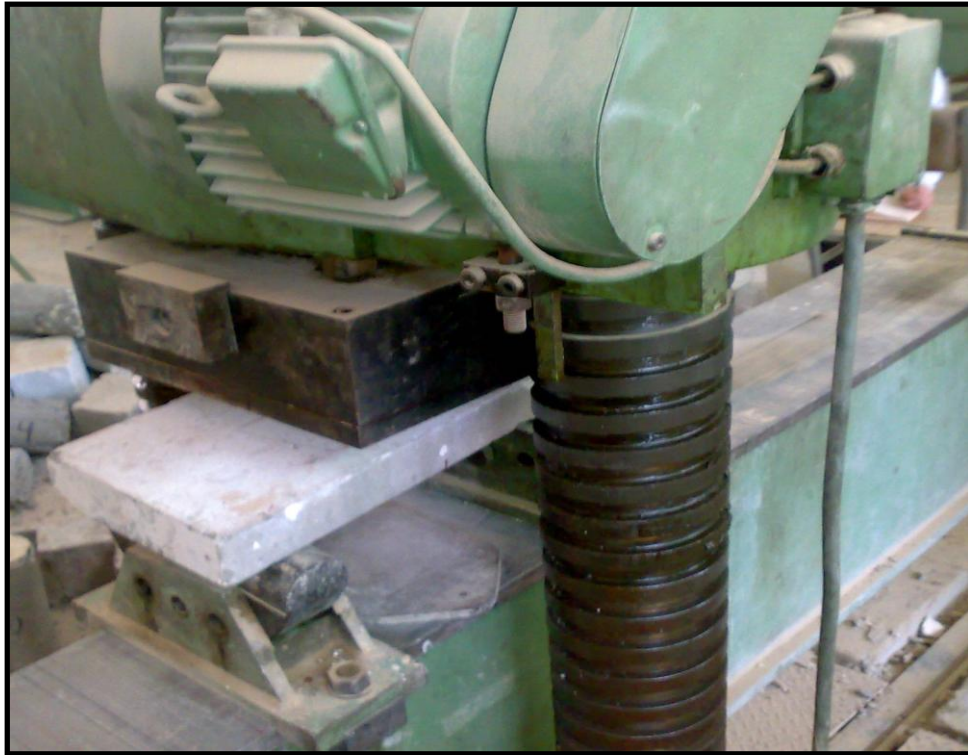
The Machine Applied Load On The Slab (Structural Laboratory In College Of Engineering In Al- Mustansirya University)
